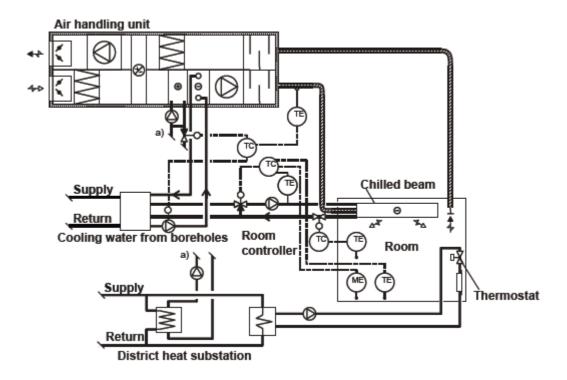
Ventilation system of Centre building Ympäristötalo /10, p.45/.
